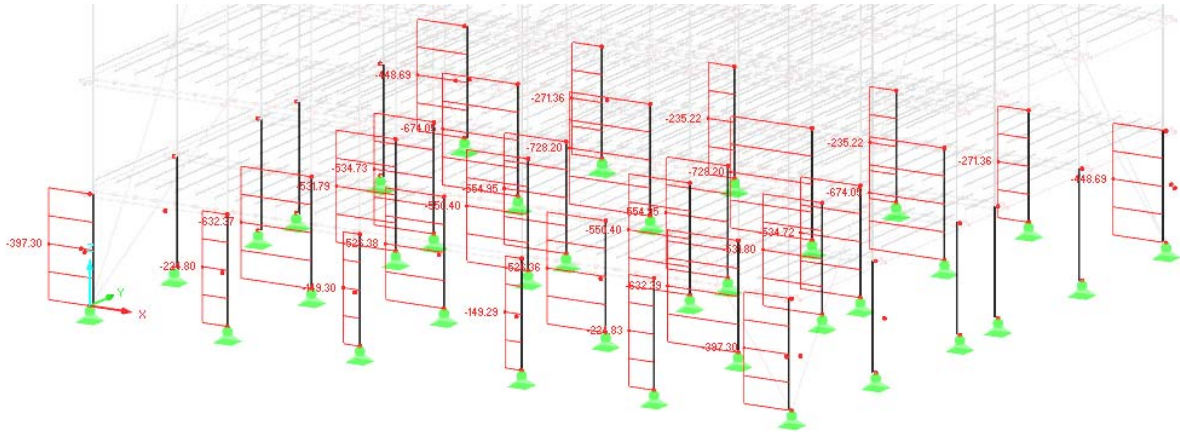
Internal normal forces in the columns of the frame construction in the first storey for LC3 (wind from the front) in [kN]
